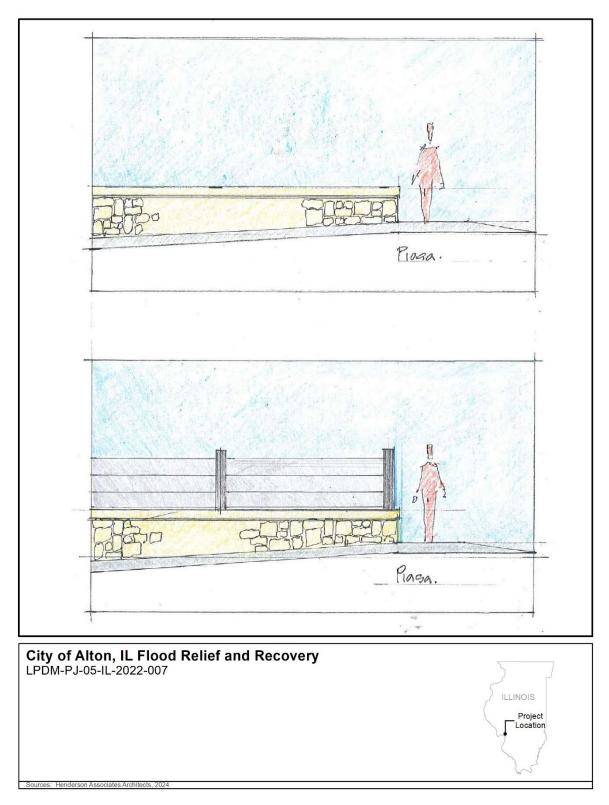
Proposed Floodwall along West Broadway at Piasa Street immediately north of the Alton Visitor Center
